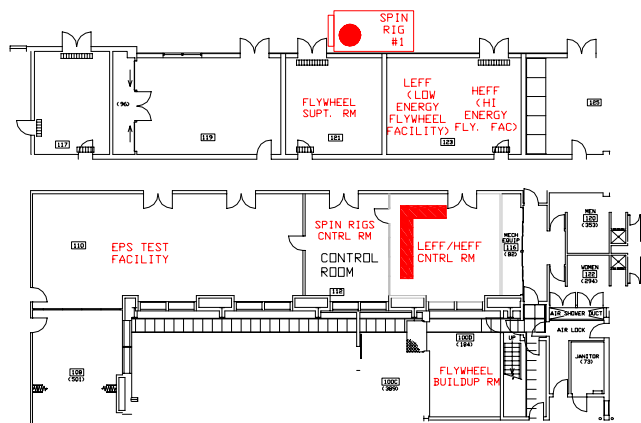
Flywheel Testbed Facilities – Building 333, NASA GRC
